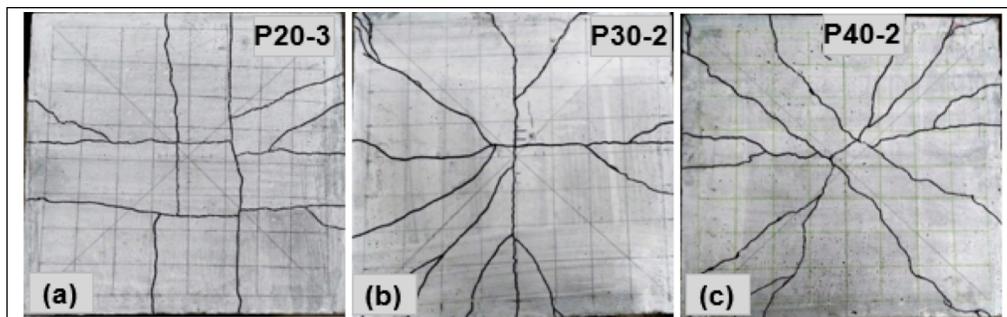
Cracks at bottom face in punching shear test; (a) Transversal cracking, (b) Transversal and diagonal mixed cracking, (c) Diagonal smeared cracking
